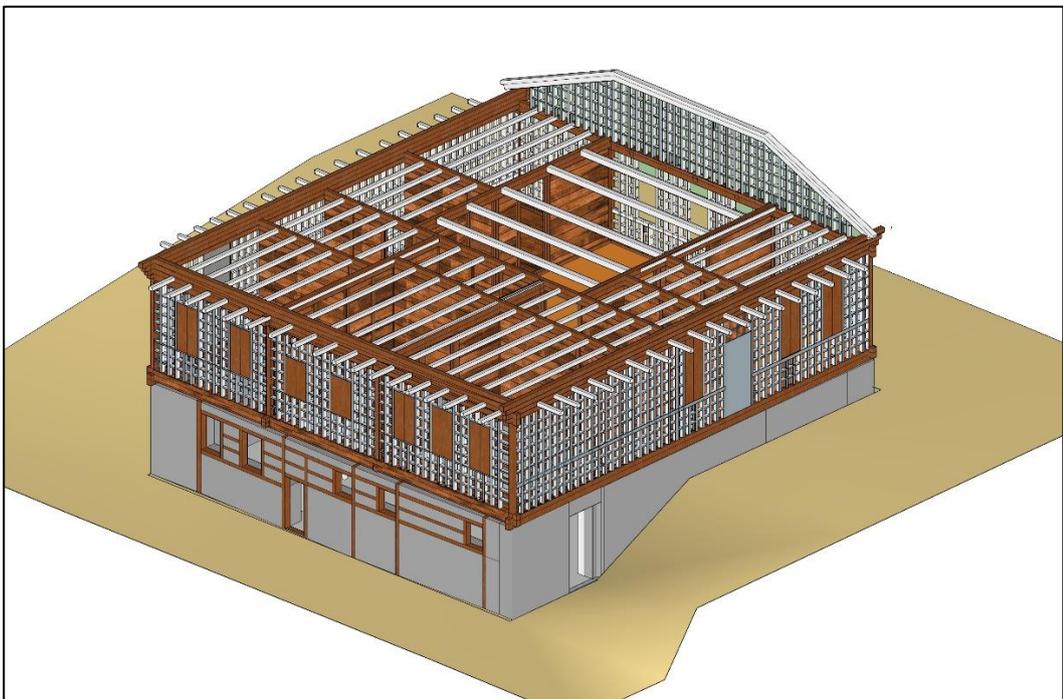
Placement of top plates of walls and ceiling joists, and construction of gable wall
